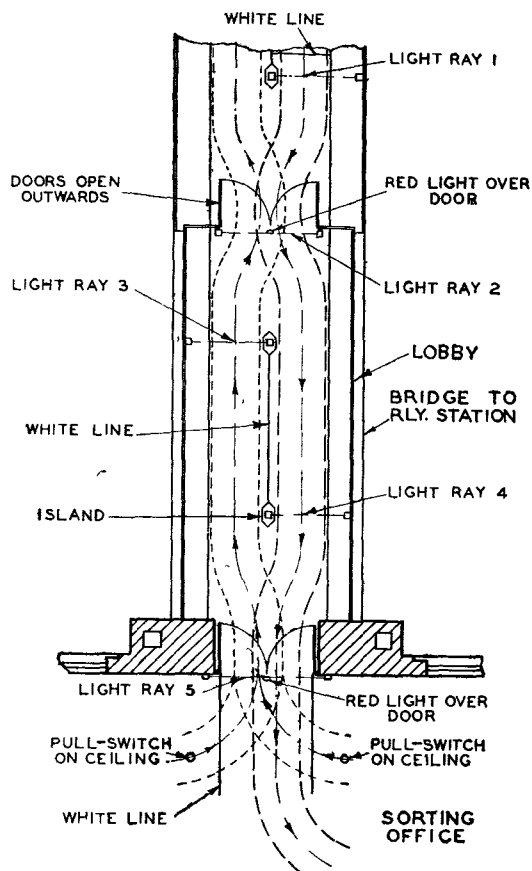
A LAYOUT OF POWER-OPERATED DOORS WITH AN AIR-LOCK.
